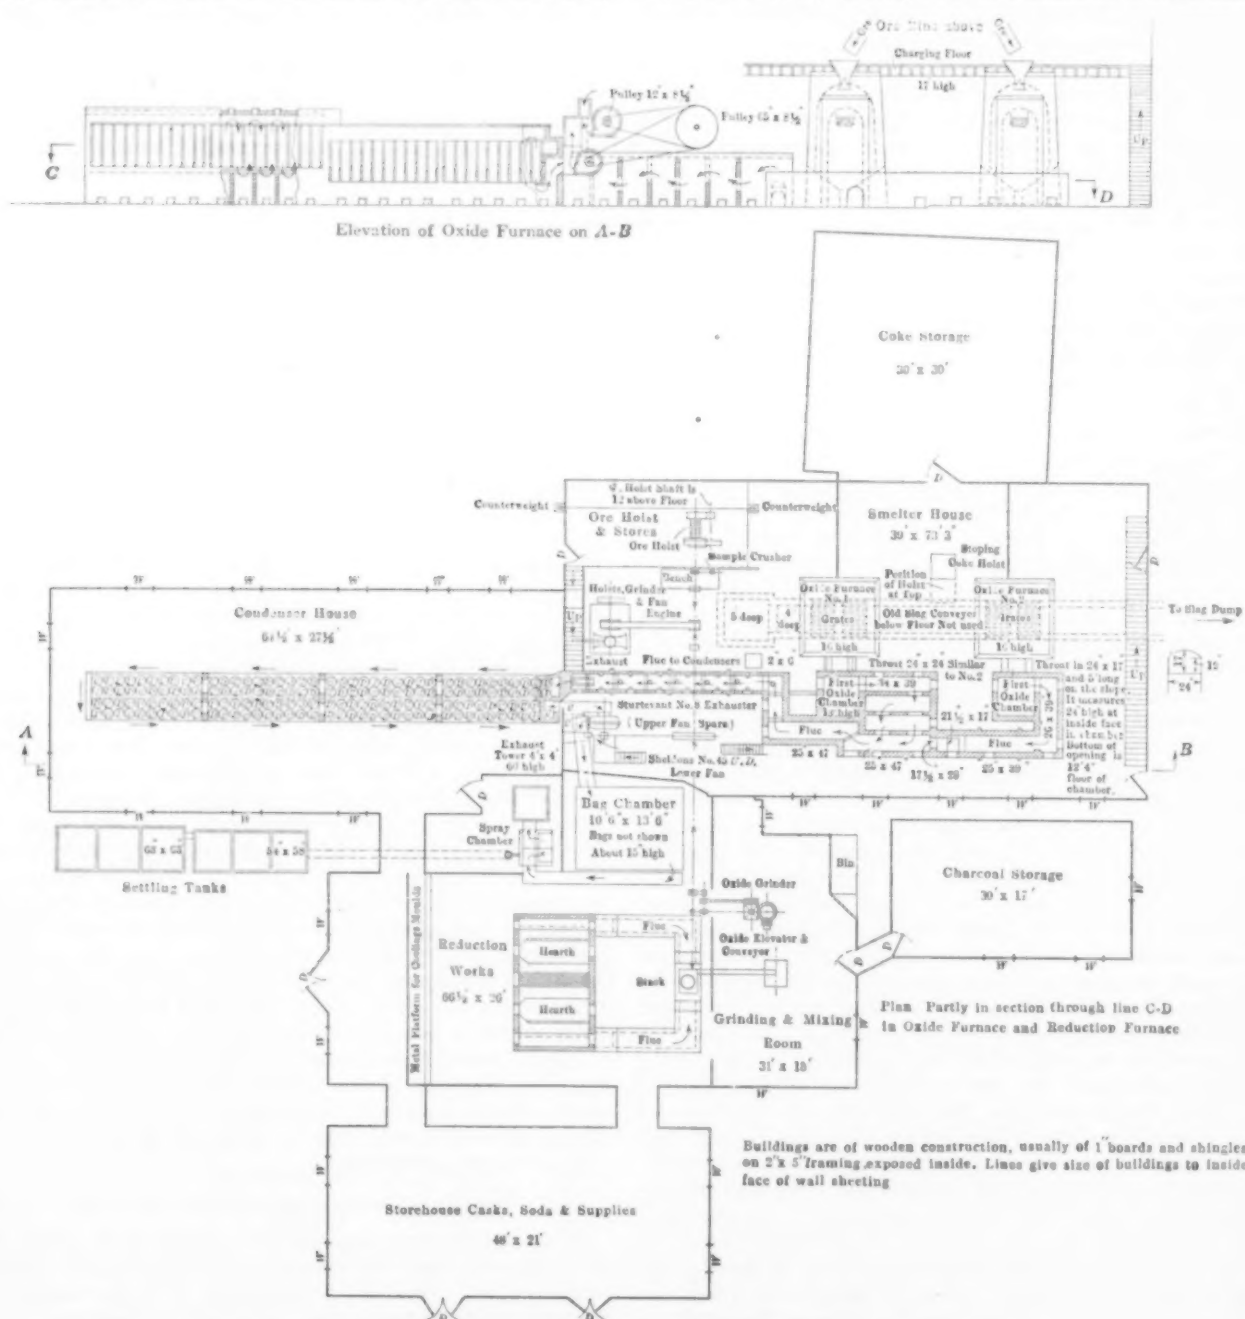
ELEVATION OF STACK FURNACE AND PLAN OF COMPLETE PLANT
